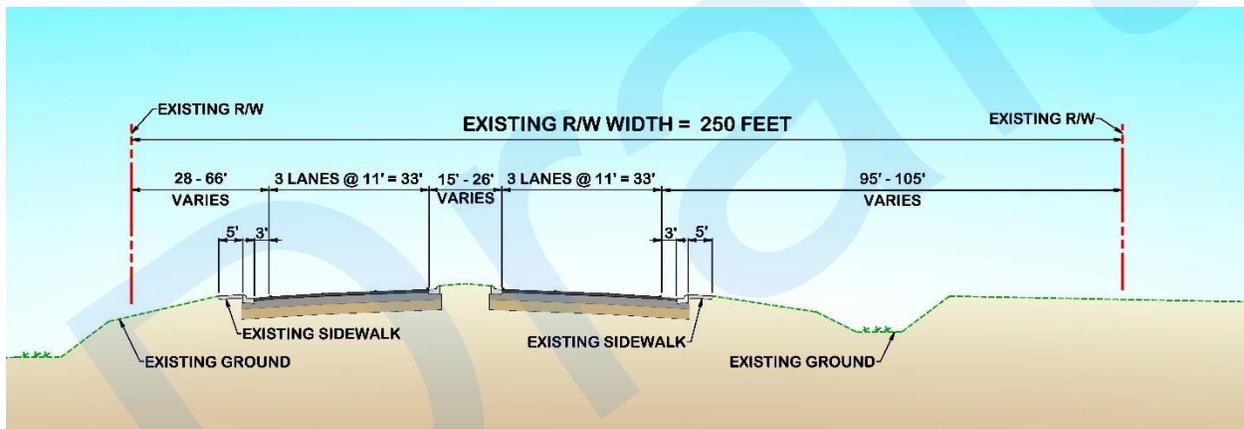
Existing SW 10th Street Typical Section – Military Trail to East Newport Center Drive
